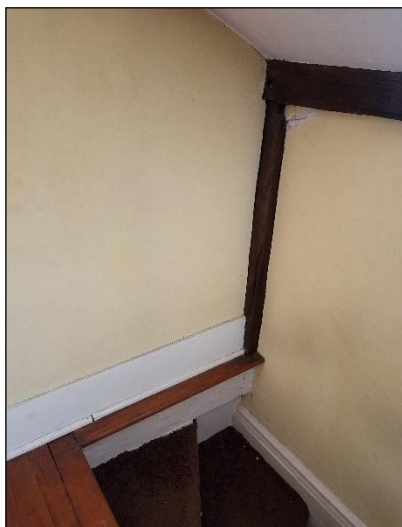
Timber frame post and plate at upper level, northeast corner of the Wing. Looking northeast.
